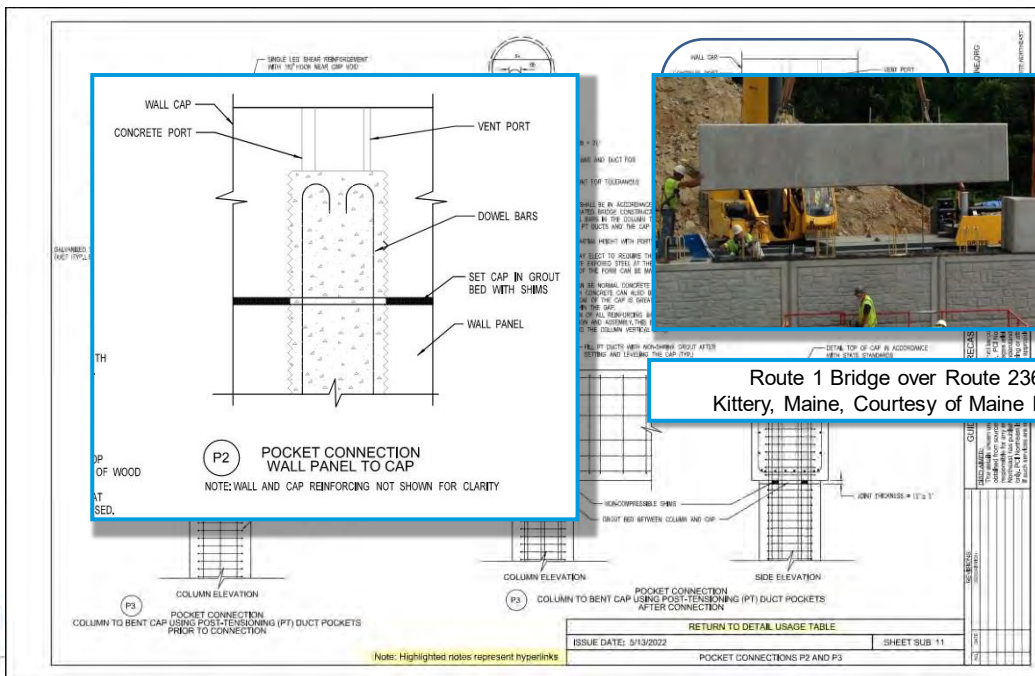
Column-Pier Cap Grouted Duct Connection
